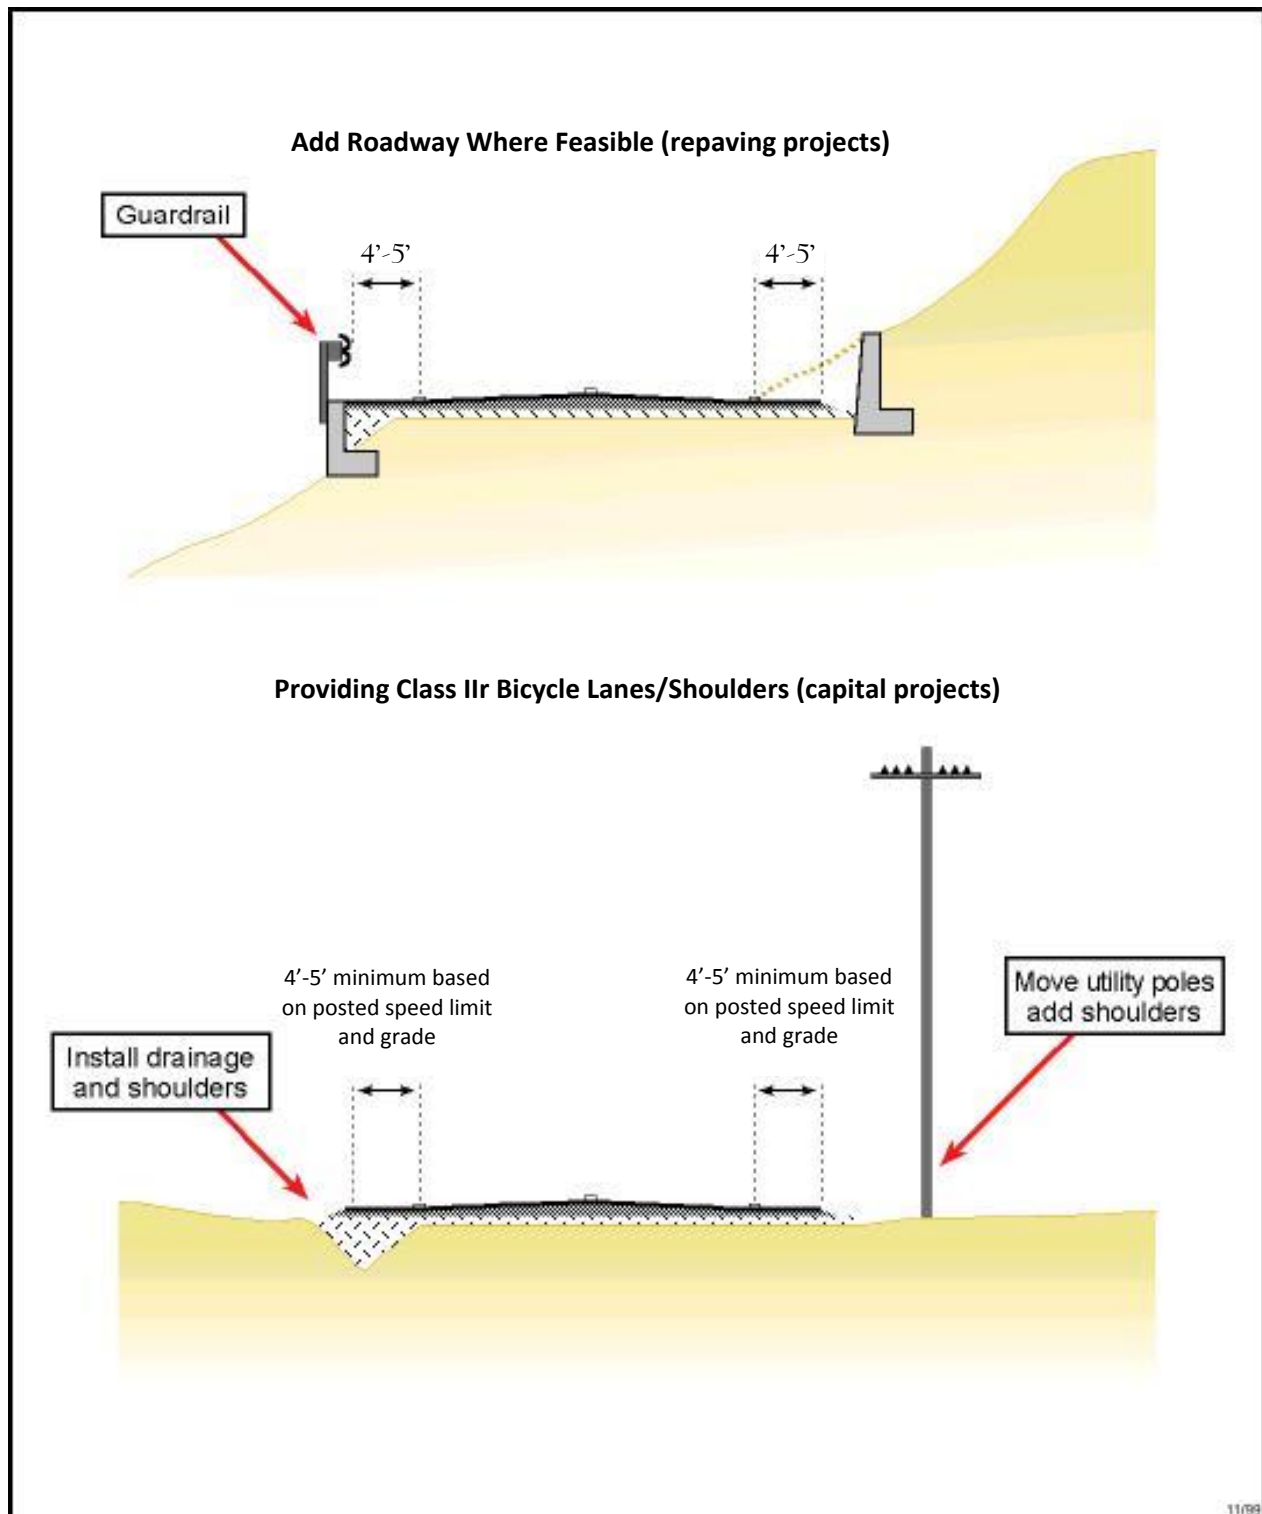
Sample Rural Roadway Improvement Cross-sections
